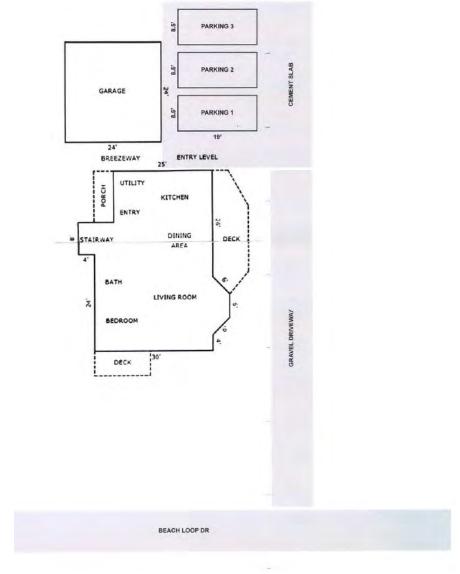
Applicant's parking site plan. Three off-street parking spaces are provided.
